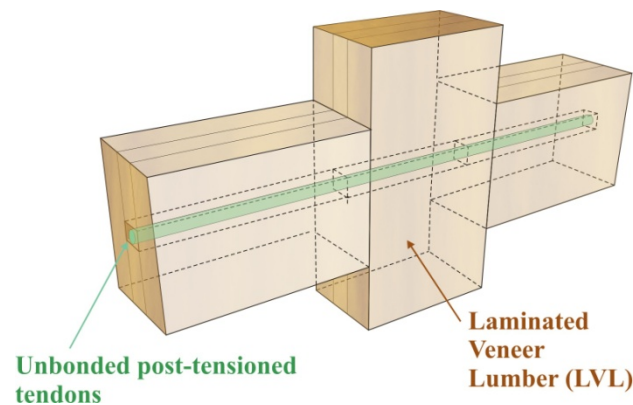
Jointed ductile beam-column connection, post-tensioned-only configuration (Courtesy of M. Newcombe)
